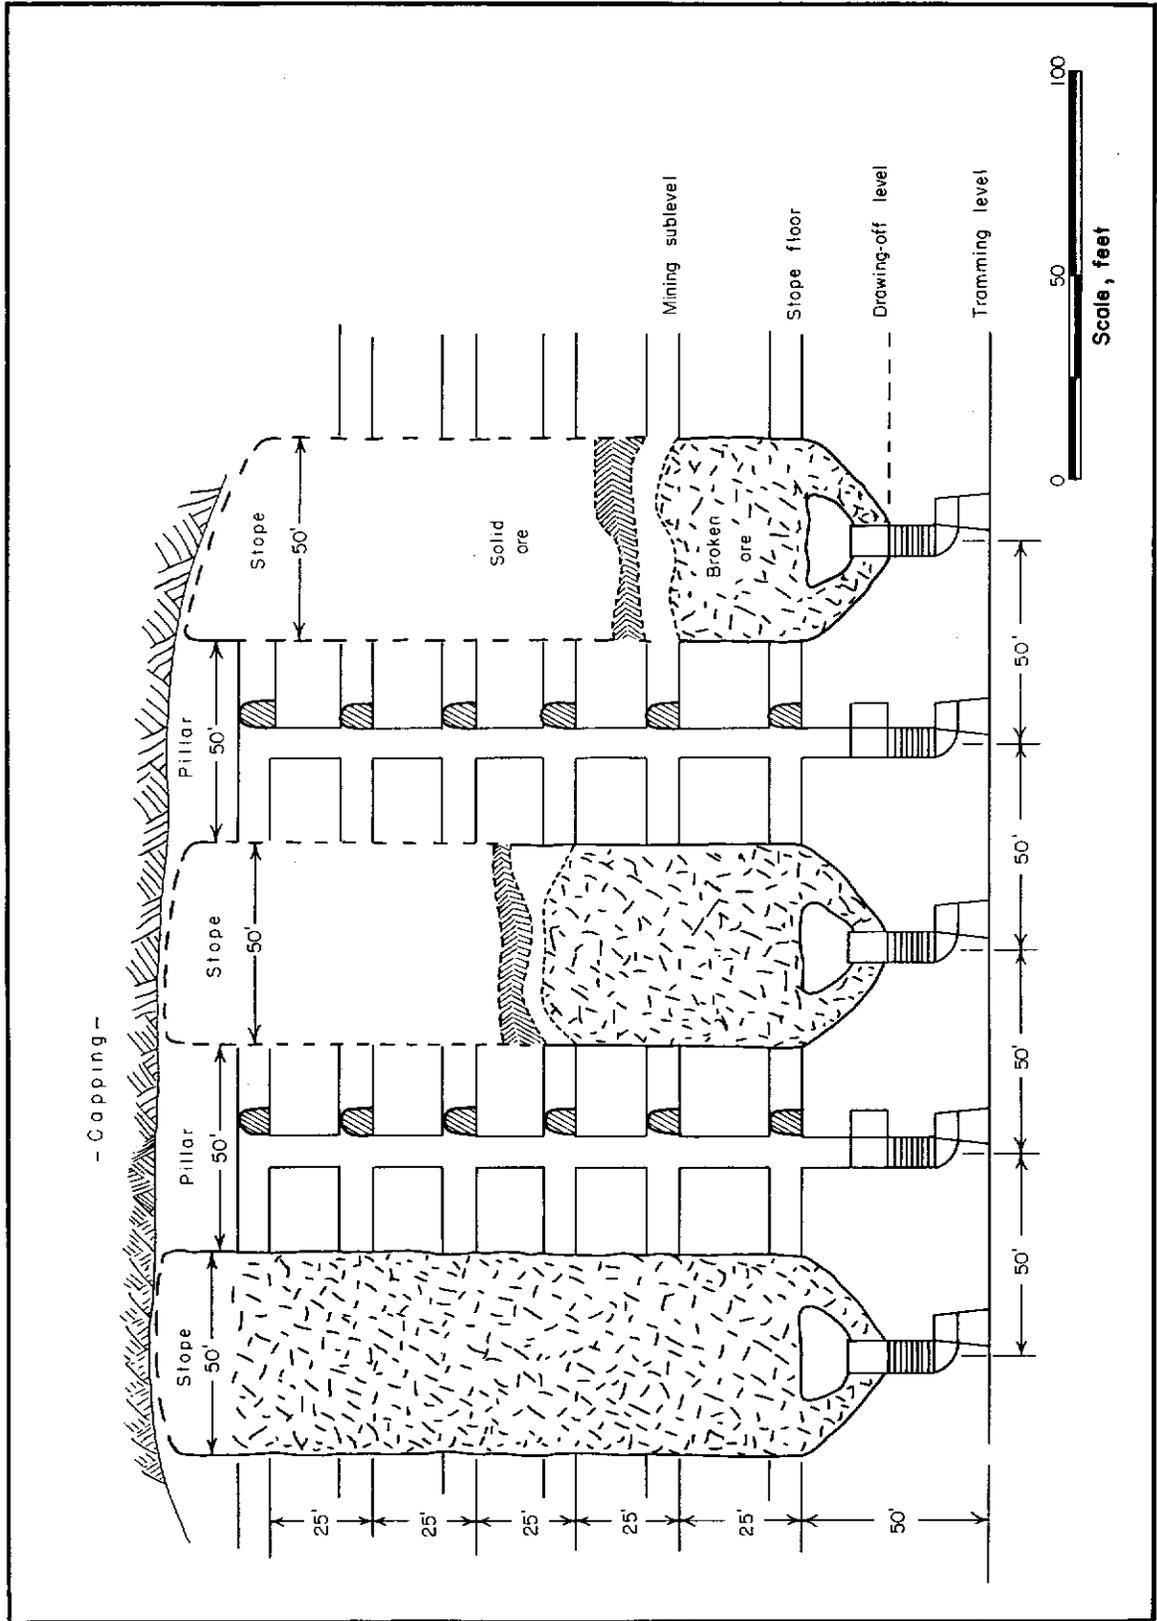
General Cross Section, Wide Shrinkage Stope and Pillar Caving System.
